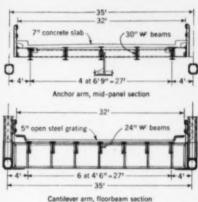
Design of Savannah River crossing is shown by typical cross sections through anchor arm at mid-panel and through cantilever arm at floor beam.
